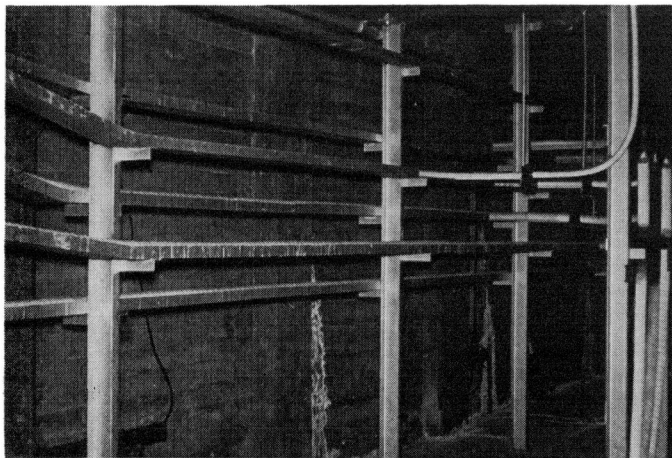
Structural steel channels supported by steel channels from trough assembly, Avon Steam Plant, East Bay Division
